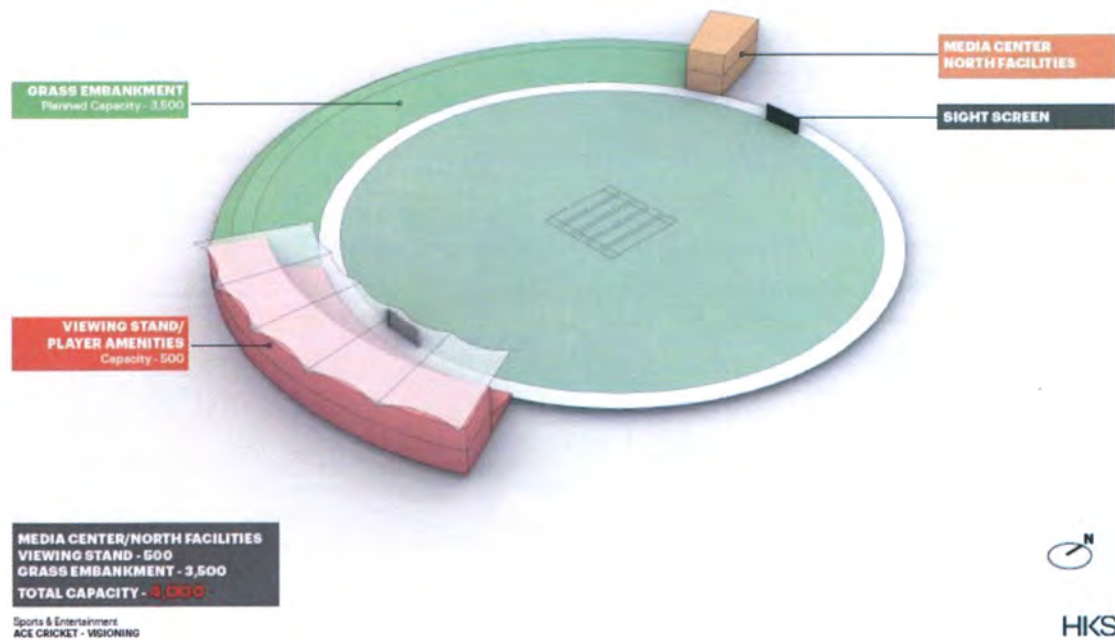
3D model of proposed stadium field and structure (HKS Architects)
